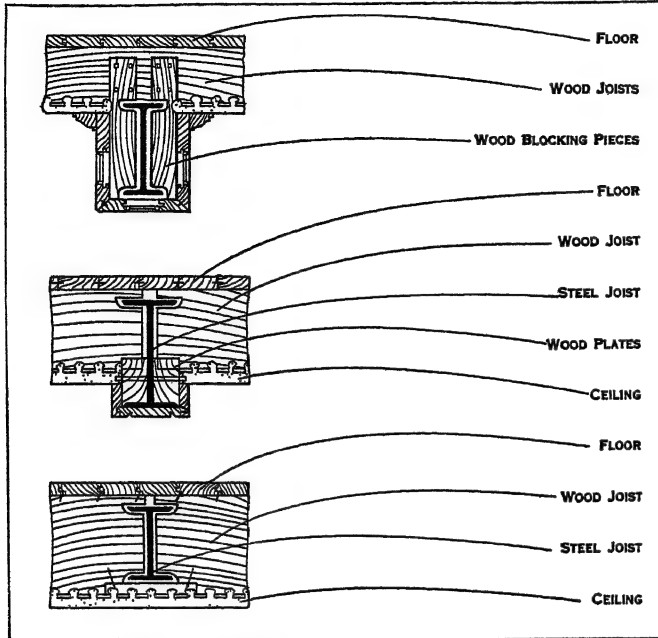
DOUBLE FLOORING, SHOWING THE WOOD PLATES BOLTED TO THE STEEL JOISTS TO RECEIVE THE ENDS OF THE SINGLE WOOD JOISTS
